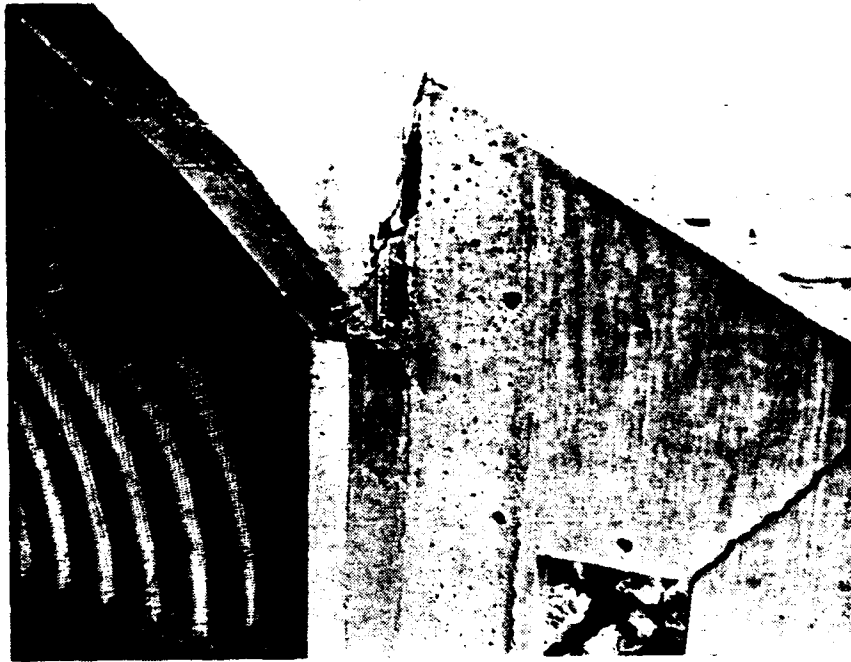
Gap between floor slab and floor of exhaust port, PAS-1.
